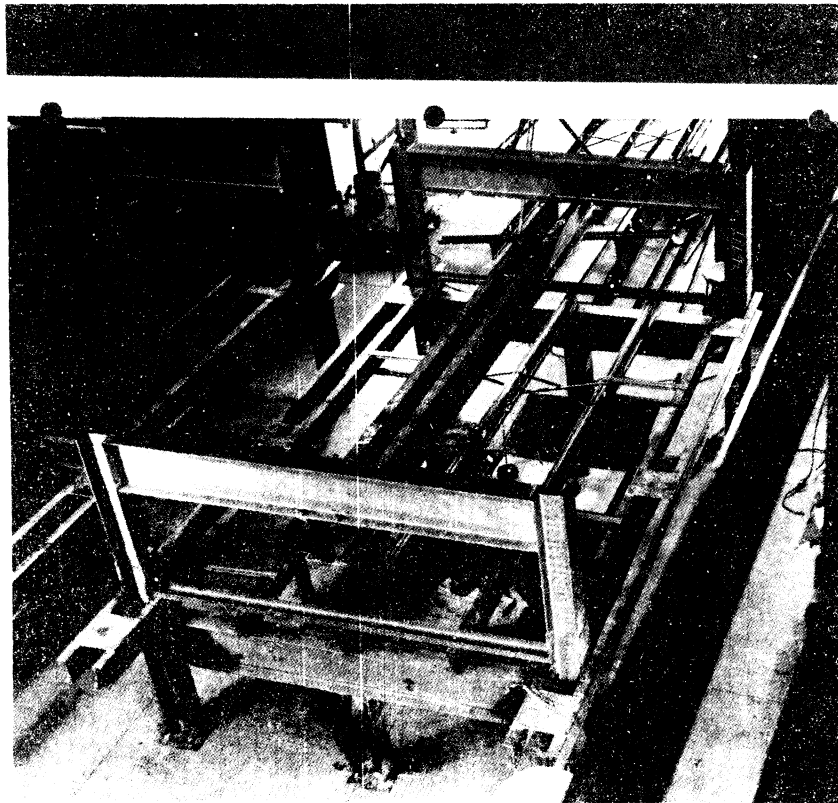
General View of Testing Frame and Test Panel - 6" Joists.
